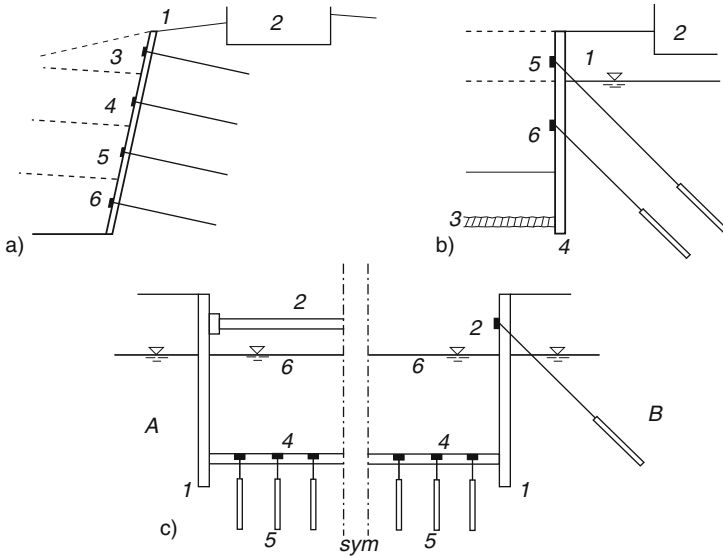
Design scenarios for back-tied structures in psammoid ground: nailed wall (a), anchored wall with grouted slab (b), walls with anchored slab (c). Numbers for the sequence
